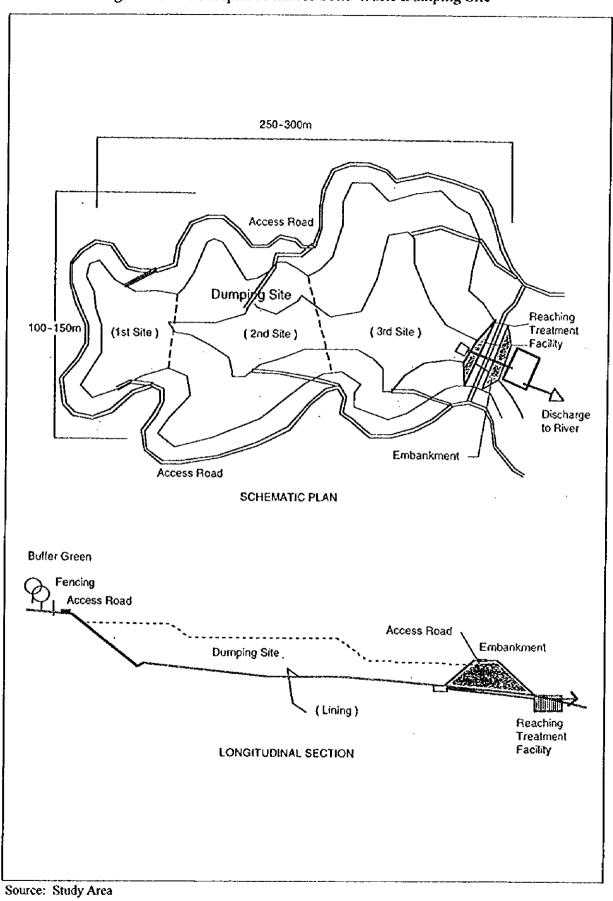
Conceptual Plan for Solid Waste Dumping Site
